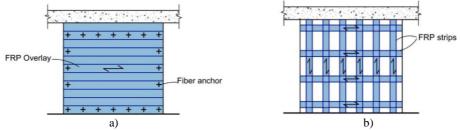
Retrofitting of masonry walls using FRCs: a) FRC overlay with fiber anchors and b) horizontal and vertical FRC strips [13]
